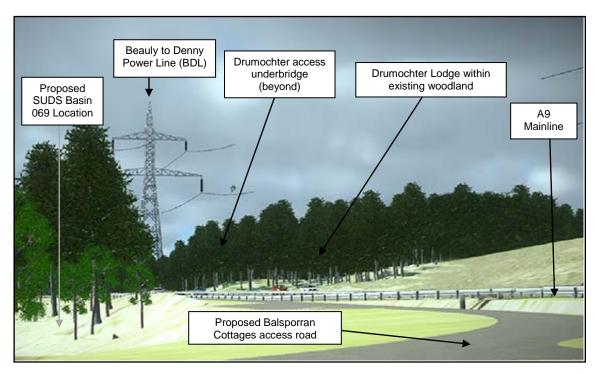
Indicative view from Balsporran access road to A9/ towards Drumochter underbridge
